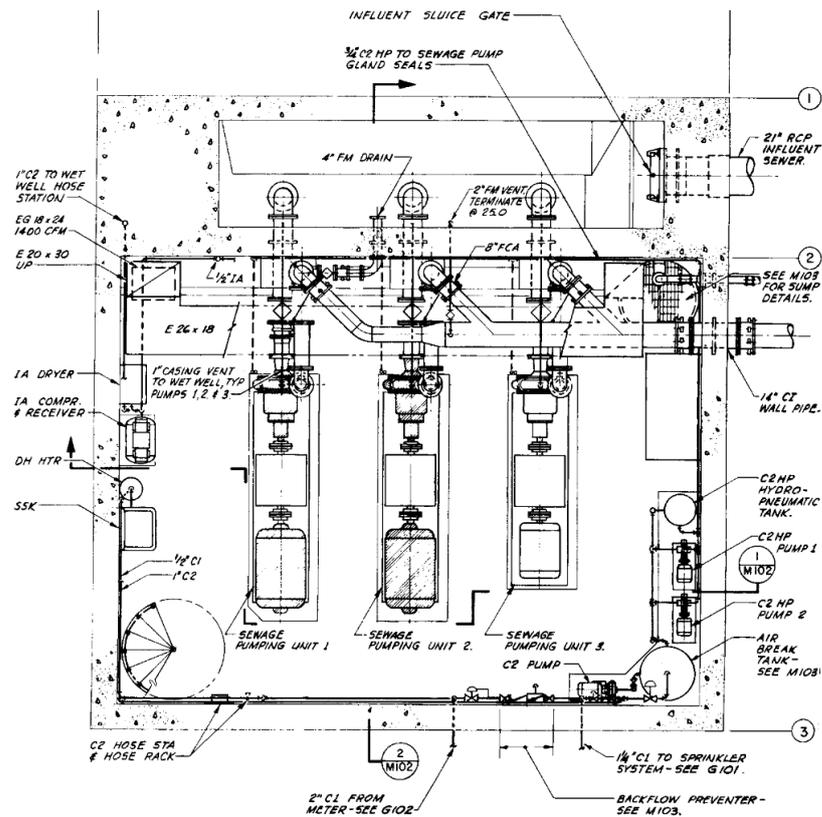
Example of a pump room plan of the wastewater pumping station (Jones, 2008)
